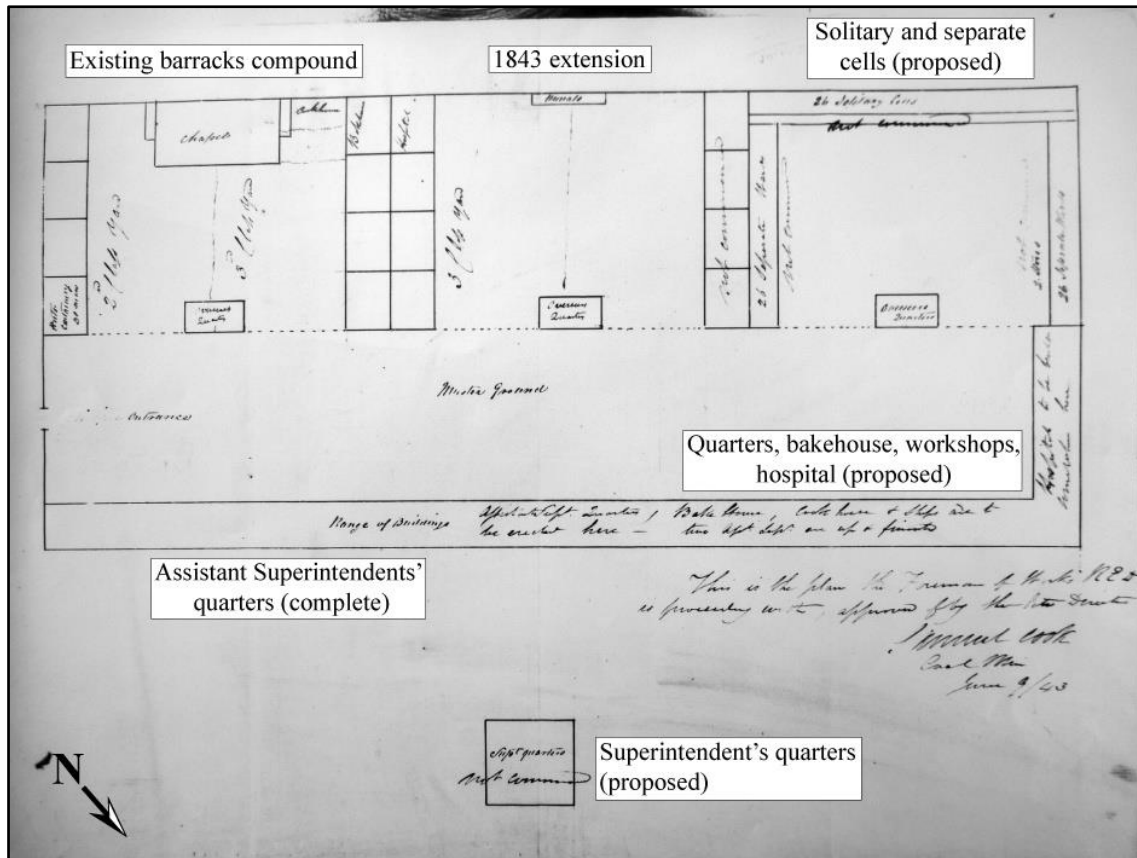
Samuel Cook's 1843 plan showing proposed extensions to the station
